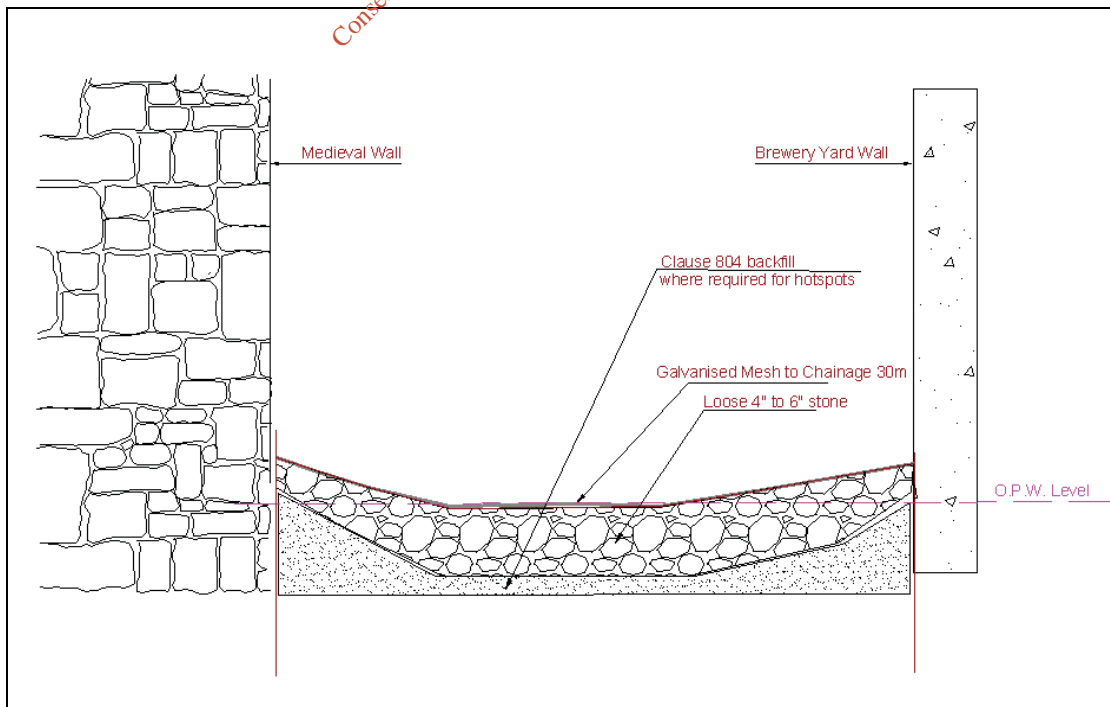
Typical Cross Section for Excavation Downstream of the On-site Bridge, Chainage 55 - 0
